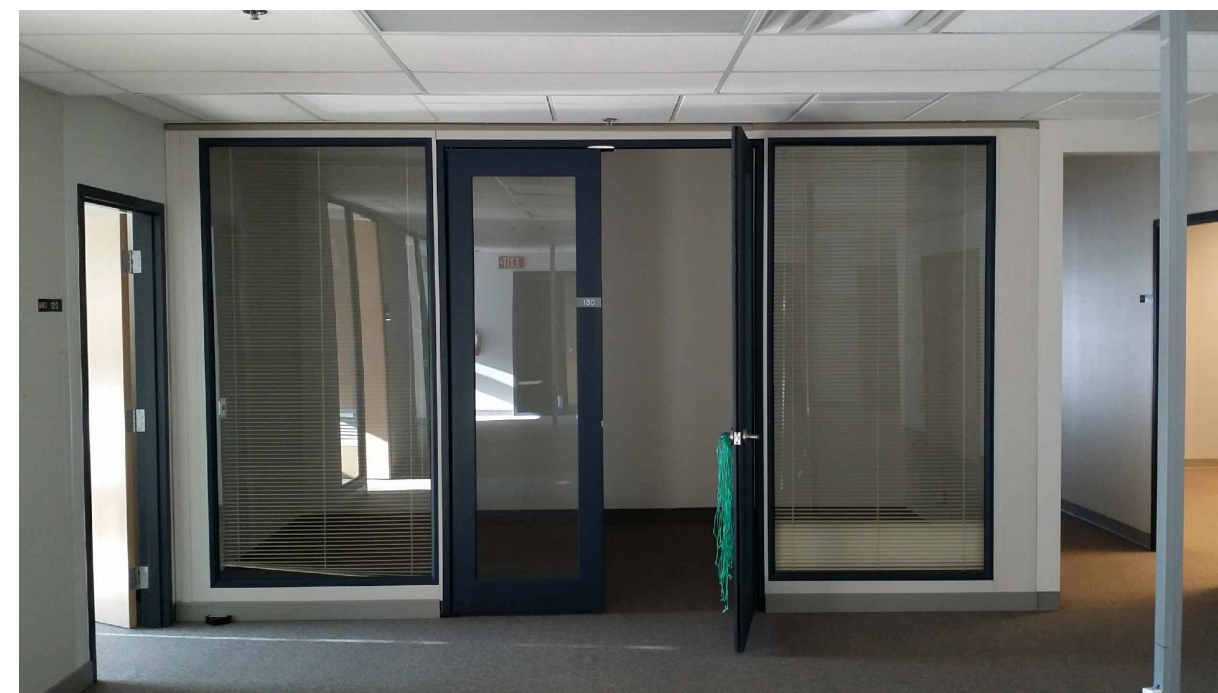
VIEW OF ENTRY DOORS AND SIDELIGHTS TO ROOM W130
